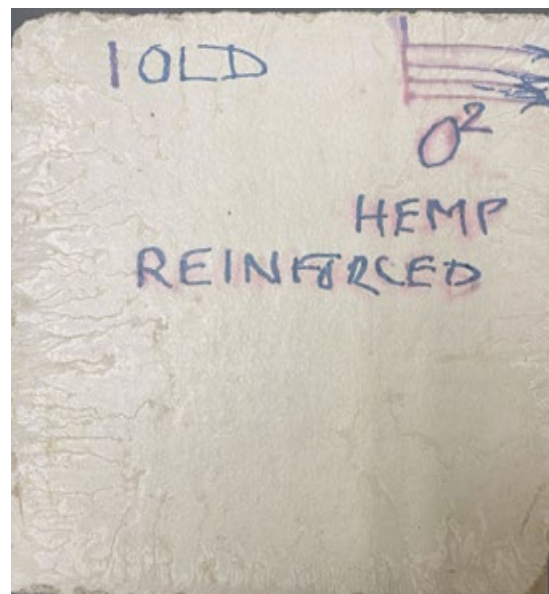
Old Hemp stems reinforced concrete panel (0)_s
